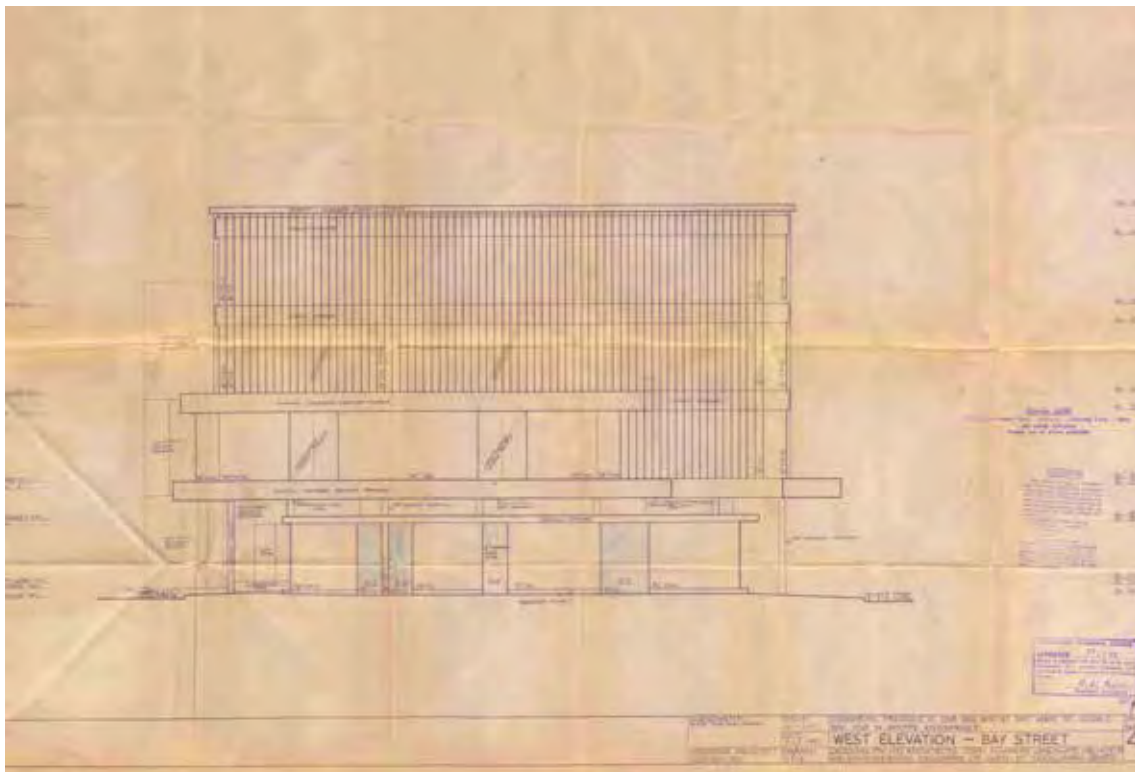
| The Bay Street (west) elevation of the Gruzman design. (Source: BA 1546/1971)
